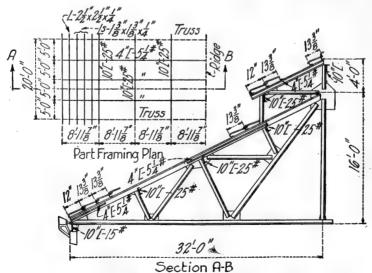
DETAILS OF A ROOF COVERED WITH LUDOWICI TILE.
